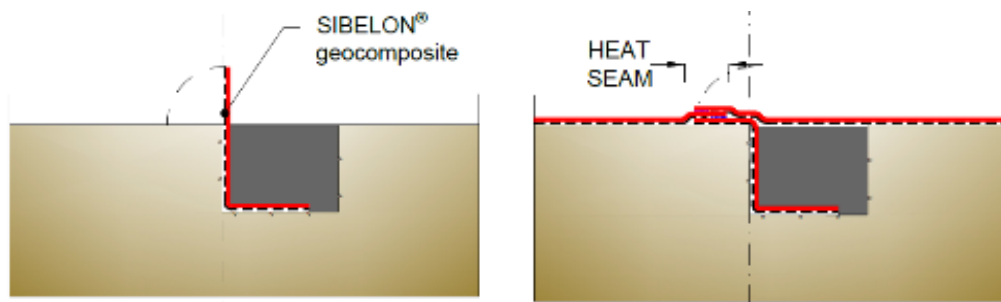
The geocomposite anchor strip is placed and ballasted in the anchorage trench, the SIBELON® geocomposite is then seamed upon the strip
